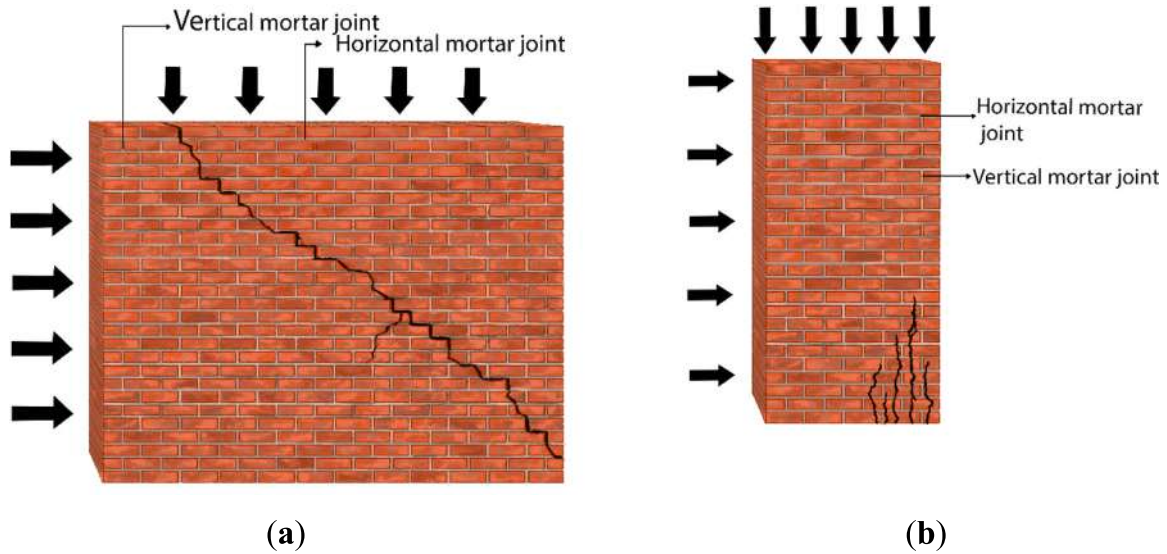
(a) Diagonal tension failure mode in URM masonry (including cracking of bricks); (b) Compression failure mode in URM masonry.
